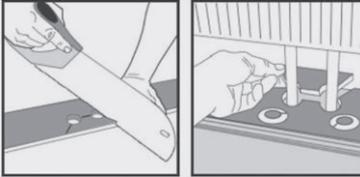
Last row (and perhaps also first row). The minimum width of the last plank should be NOT LESS than 50mm. Remember distance to wall is 15mm. TIP: Put a spacer before measuring. Cut the panels lengthwise and glue the short ends. See instructions below.
